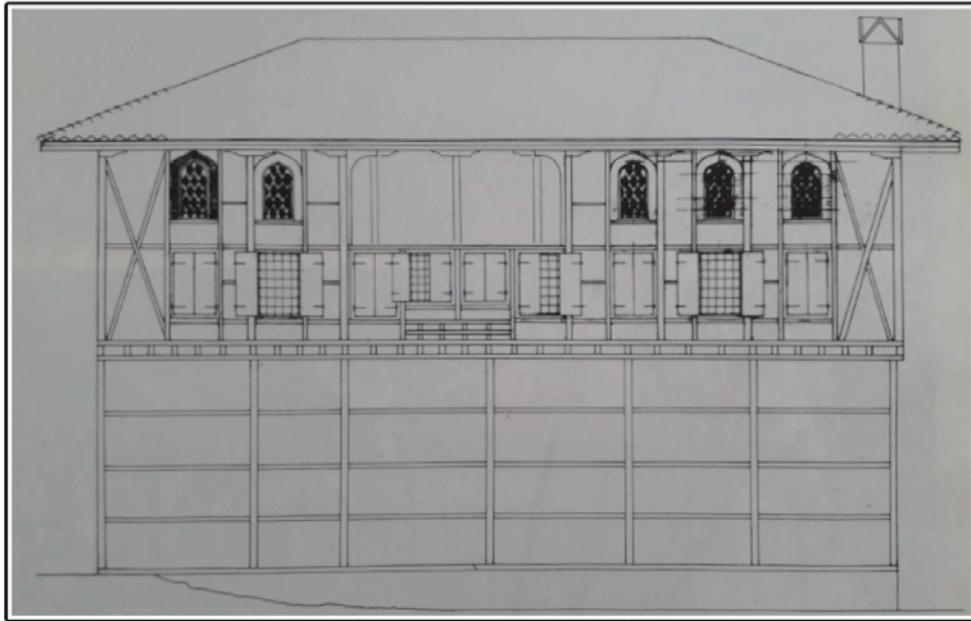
Elevation of Muradiye House. (Source: Eldem 1984, p.101)
